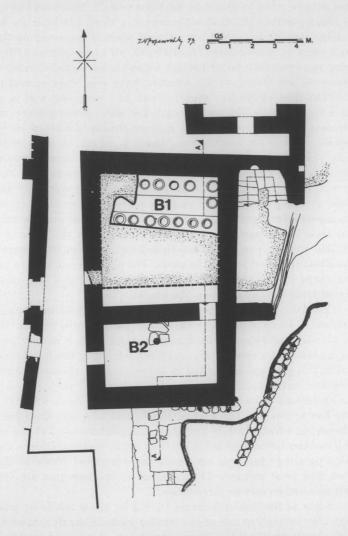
Sector B. Plan of the ground floors of Rooms B1 and B2.
